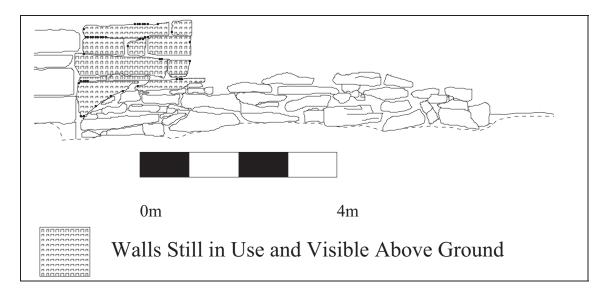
Relationship between existing walls and uncovered Walls in Area 2.
